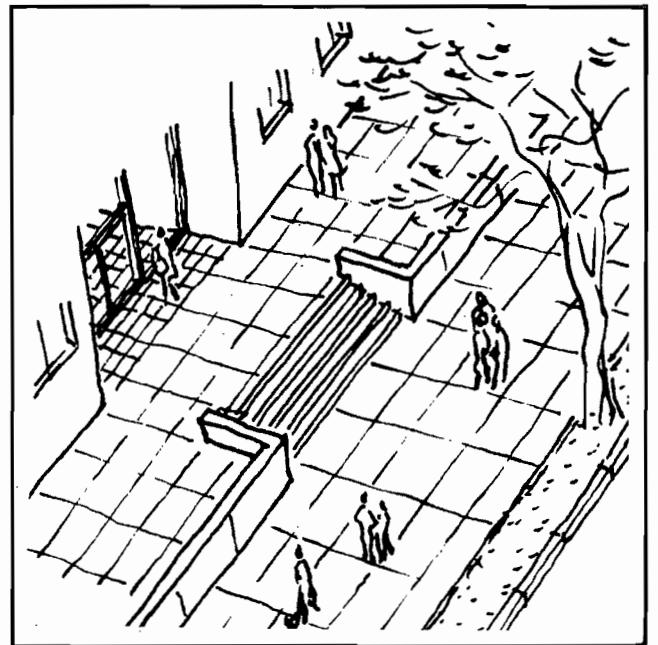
Zones of Transition Between Public Street, Project Grounds, and Building Interior
